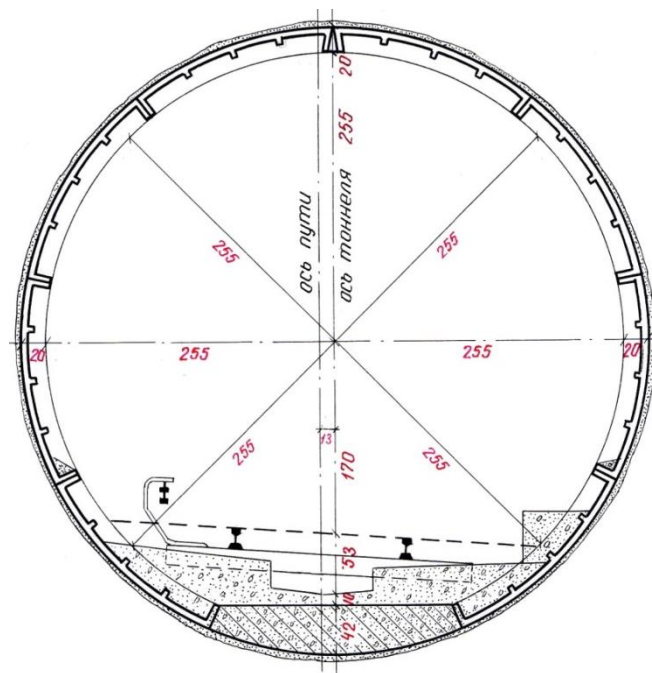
Tunnel frame with inserted flat reinforced concrete tray unit
